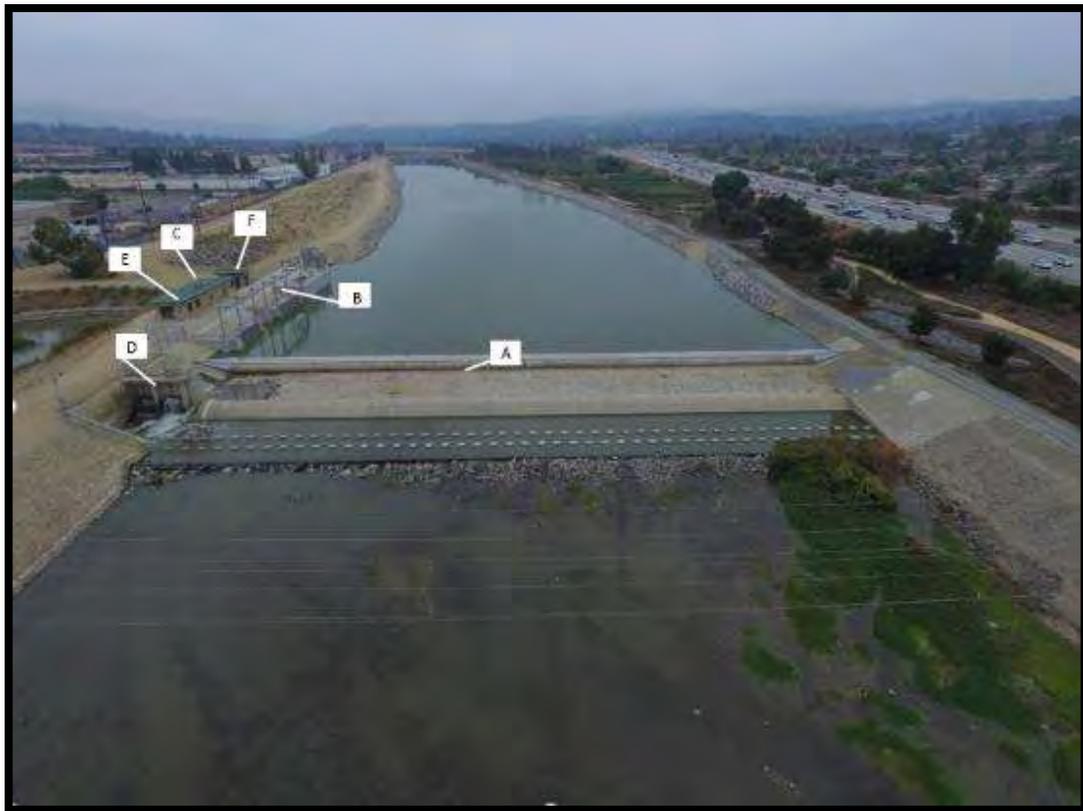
Imperial Head Gates looking East (upstream): (A) Imperial Rubber Dam, (B) Trash rack system, (C) Diversion gates, (D) Bypass gates (E) Dam (control) house and (F) generator building.
